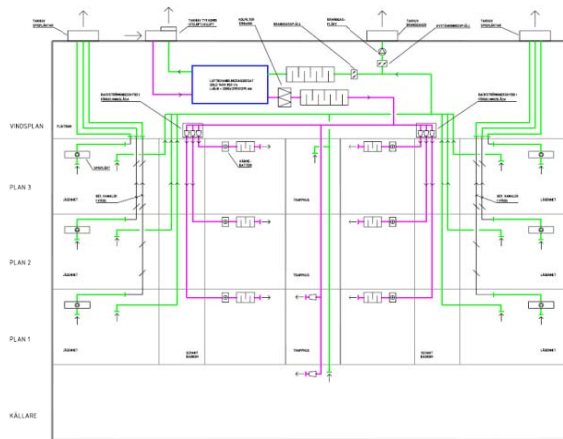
Designed ventilation system for the buildings with central ventilation, building E and F.
